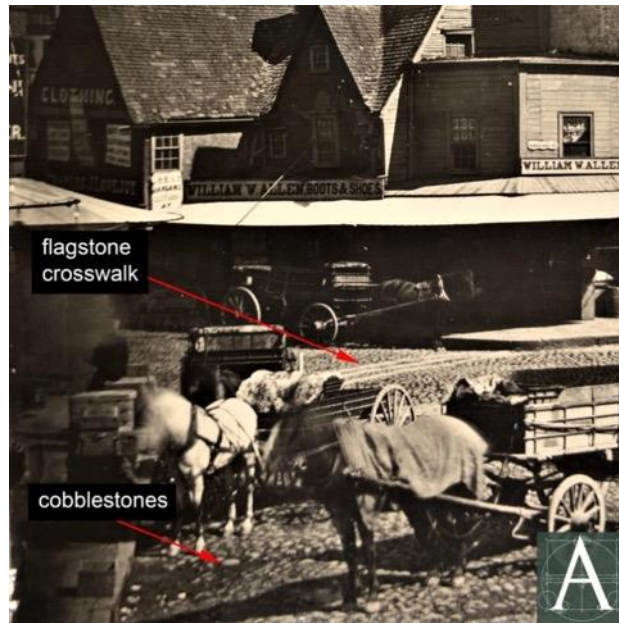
Cobblestone street paving with crosswalks of flagstone at Dock Square, Boston, Massachusetts, ca. 1860. This particular arrangement of surfaces had been maintained for at least two decades, and it demonstrates the preferential pavement of crosswalks that would remain common into the concrete sidewalk era. Image courtesy of Historic New England, via Archipedia New England.
